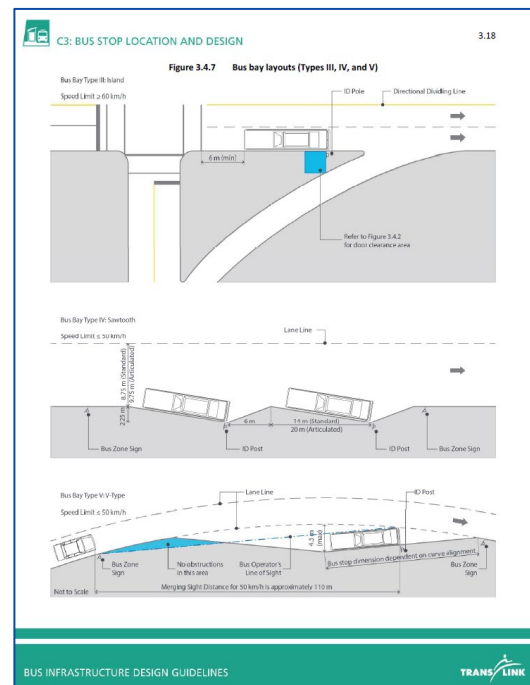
TRANSLINK PROVIDES DESIGN RECOMMENDATIONS FOR VARIOUS ON-ROAD AND OFF-ROAD STOP CONFIGURATIONS
